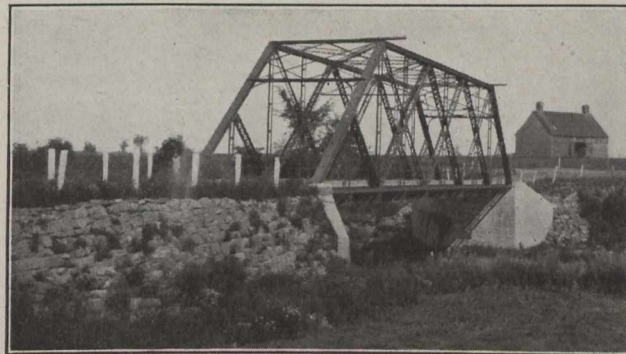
Steel Bridge Over Carter River at Charlebois.
